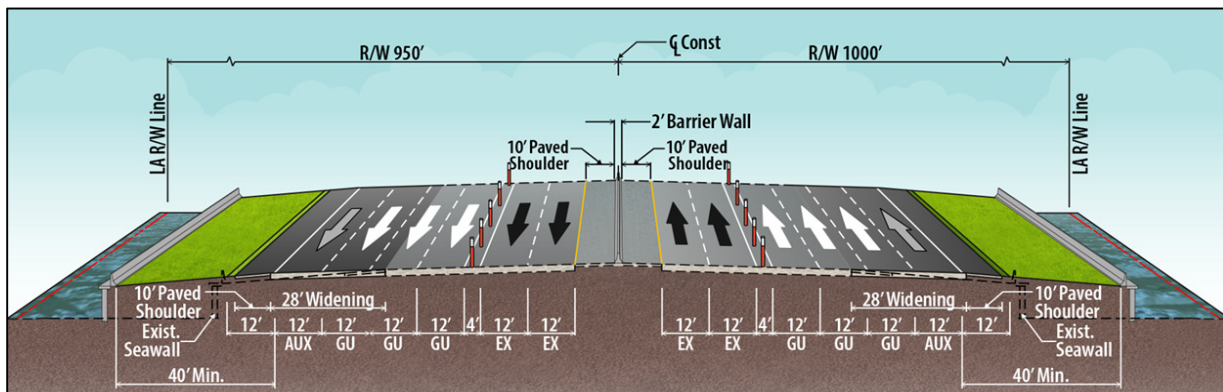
I-275 Mainline Master Plan Build Alternative Typical Section from north of 4th Street North to 1.0 mile south of the Howard Frankland Bridge (Segment C-MP4)
